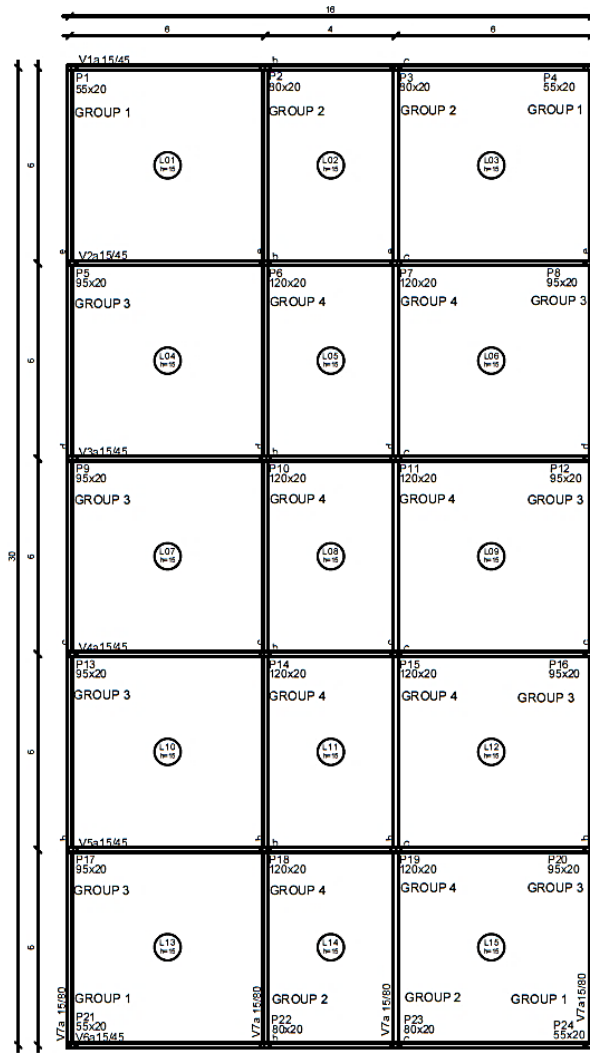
Formwork drawing of the building, showing the different groups of columns.
